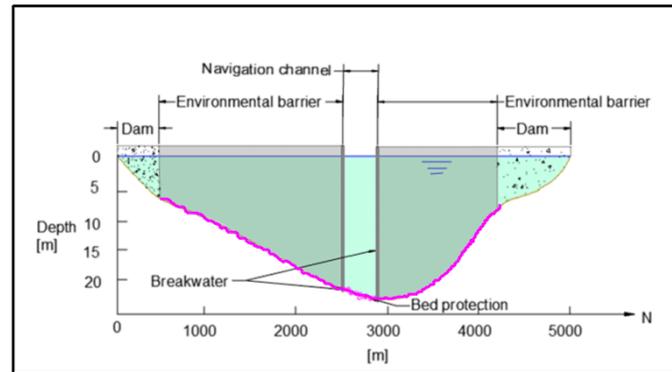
2. Schematic front view of a barrier with open navigational section in the South Channel (not to scale)
